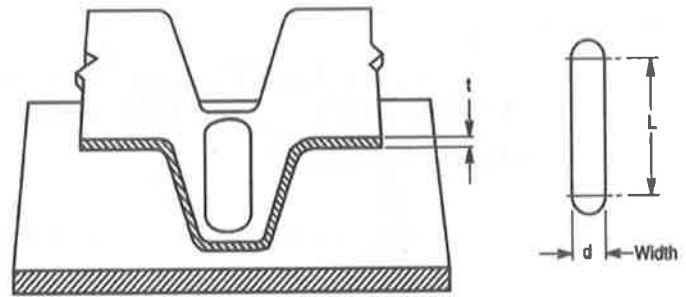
Arc Seam Welds – Sheet to Supporting Member in Flat Position
